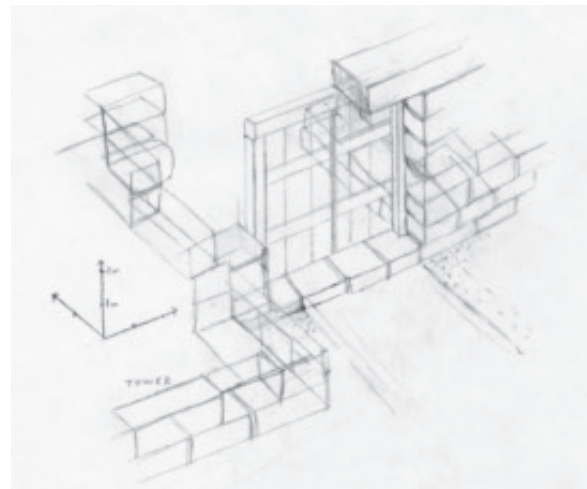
Isometric reconstruction drawing of the Northwestern Gate showing how the doorframe was most likely constructed. (N. Michaelides).
